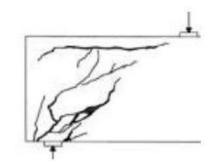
Anchorage failure (Hong, et al., 2002)
